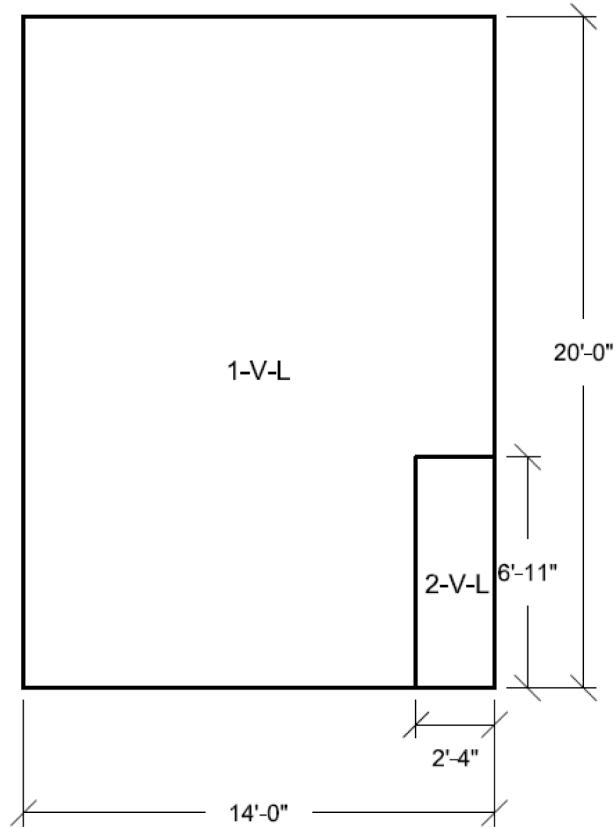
H.6-178 DGFOSV Wall 10 Looking From Outside Vertical Reinforcement Zones Near Side Face
